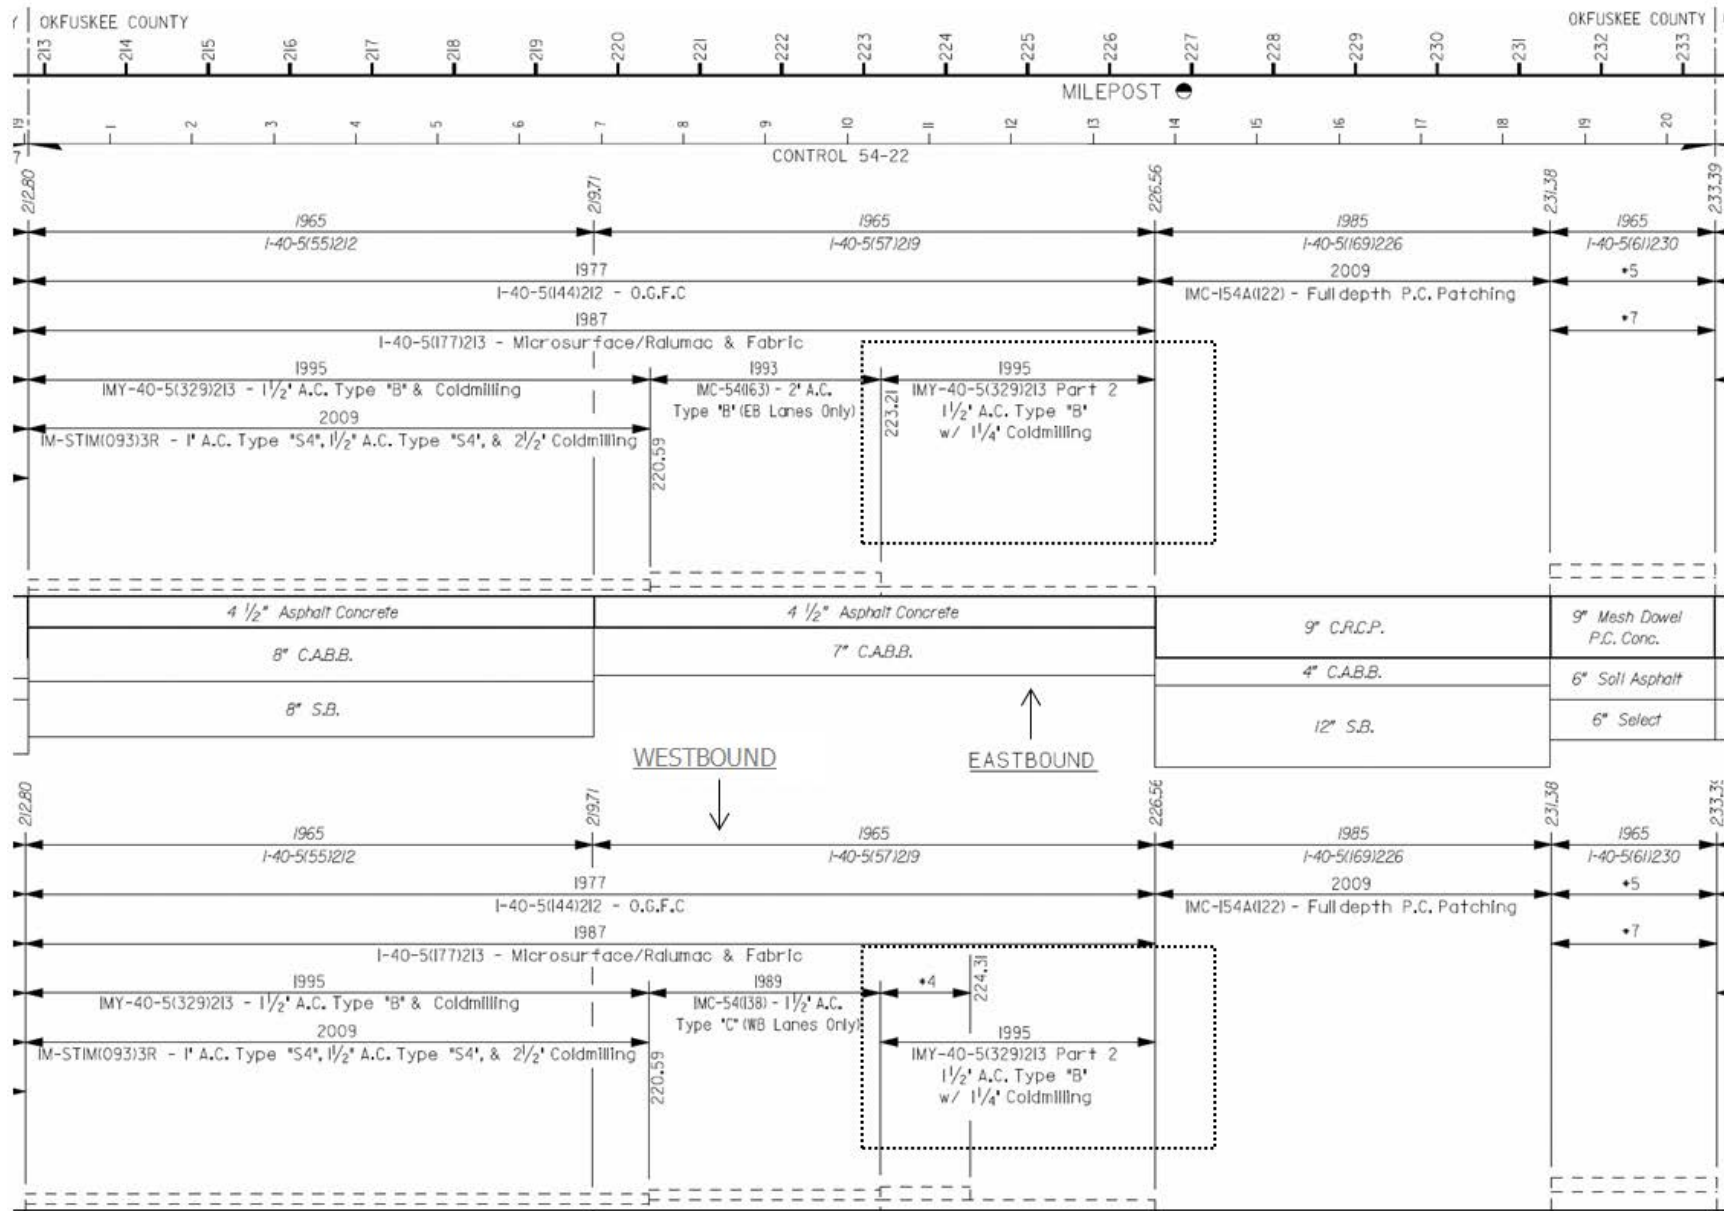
Structural Pavement History for Control Section 54-22 (Eastbound and Westbound)
